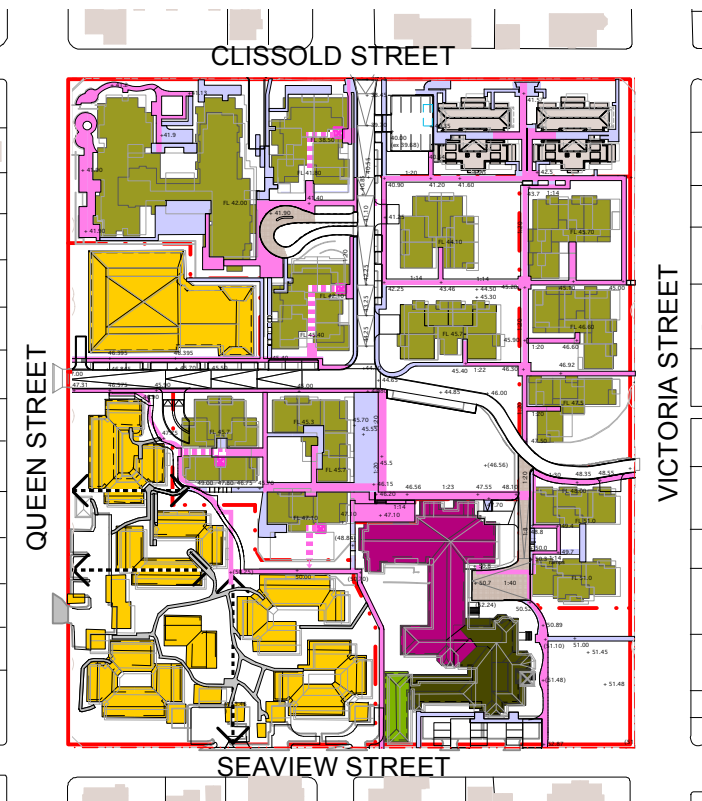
Part 2 of Stage 4. The renewal of the site continues with the demolition of villas addressing Victoria Street to provide a setting for Glentworth House and street address.
